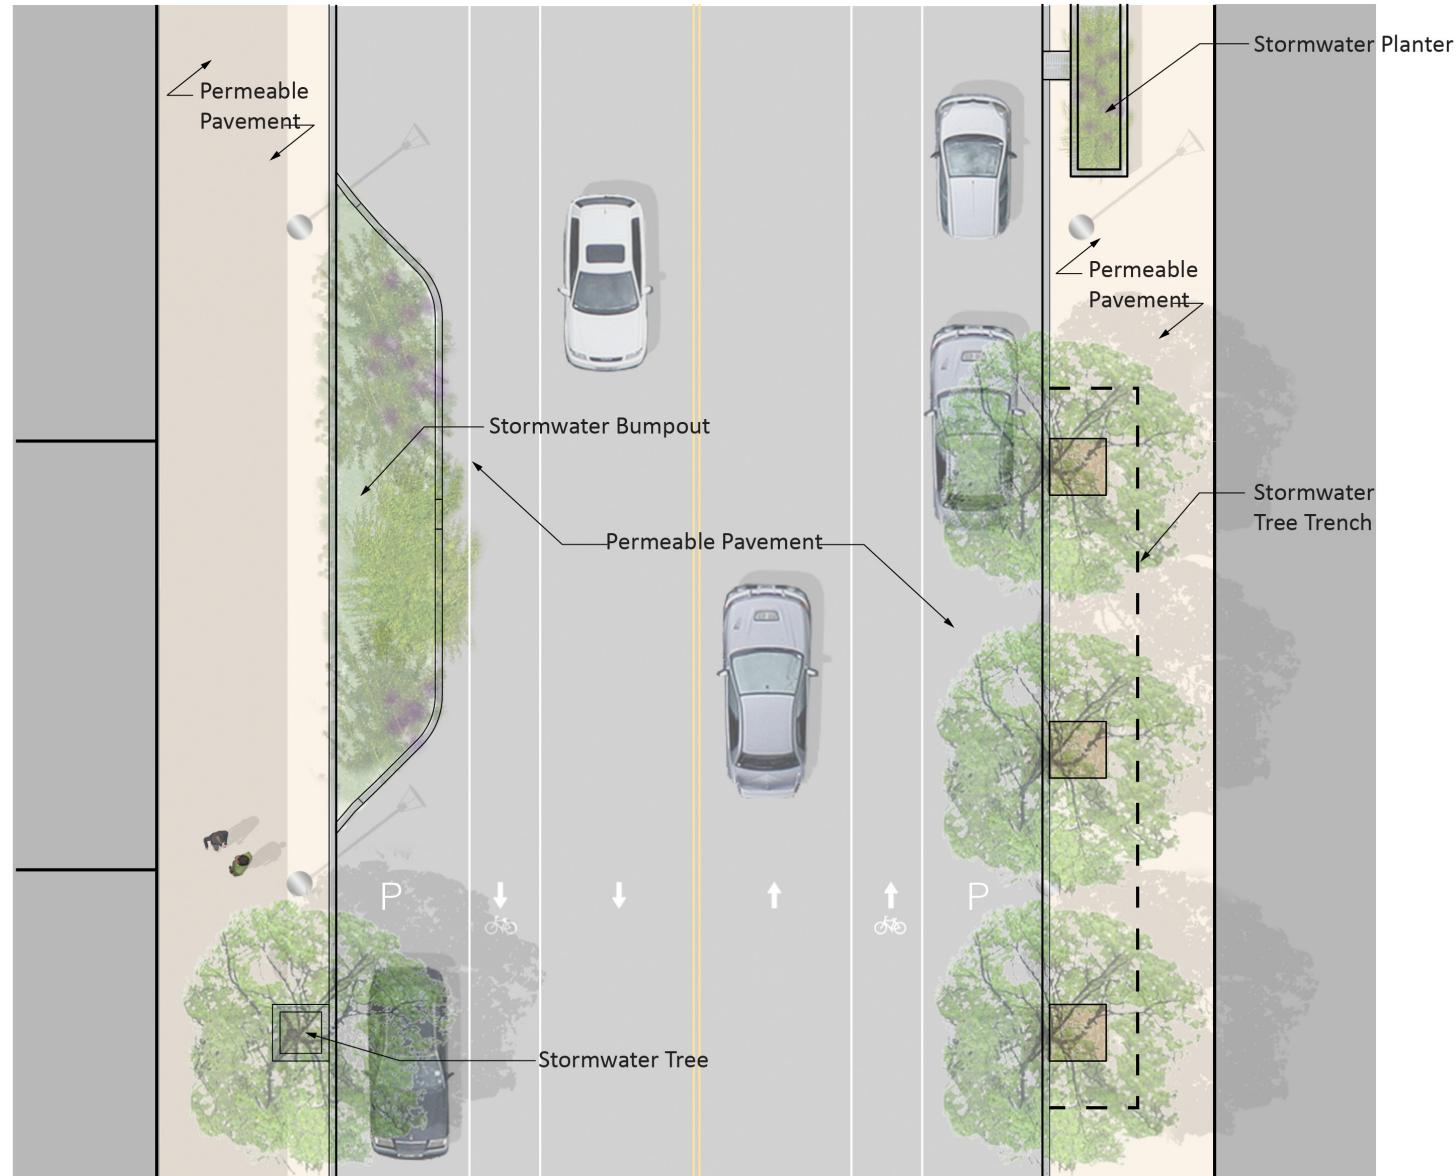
Plan View of typical SMP layout within street right-of-way
